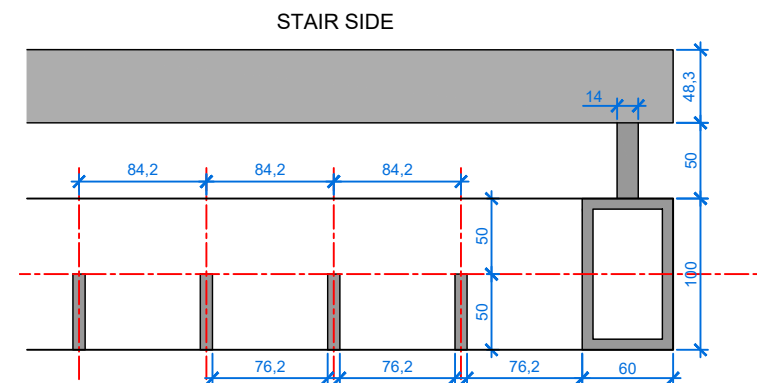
BALUSTRADE AND HANDRAIL PLAN DETAIL
